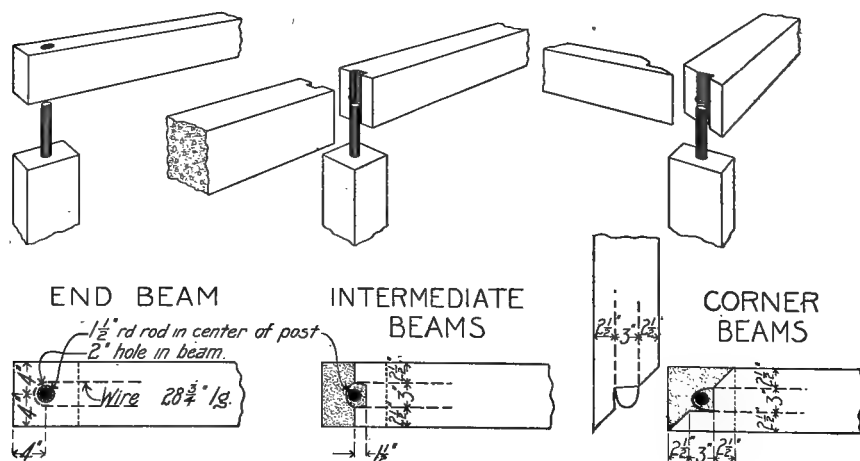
Method of joining end beam, intermediate beams and corner beams to column.
